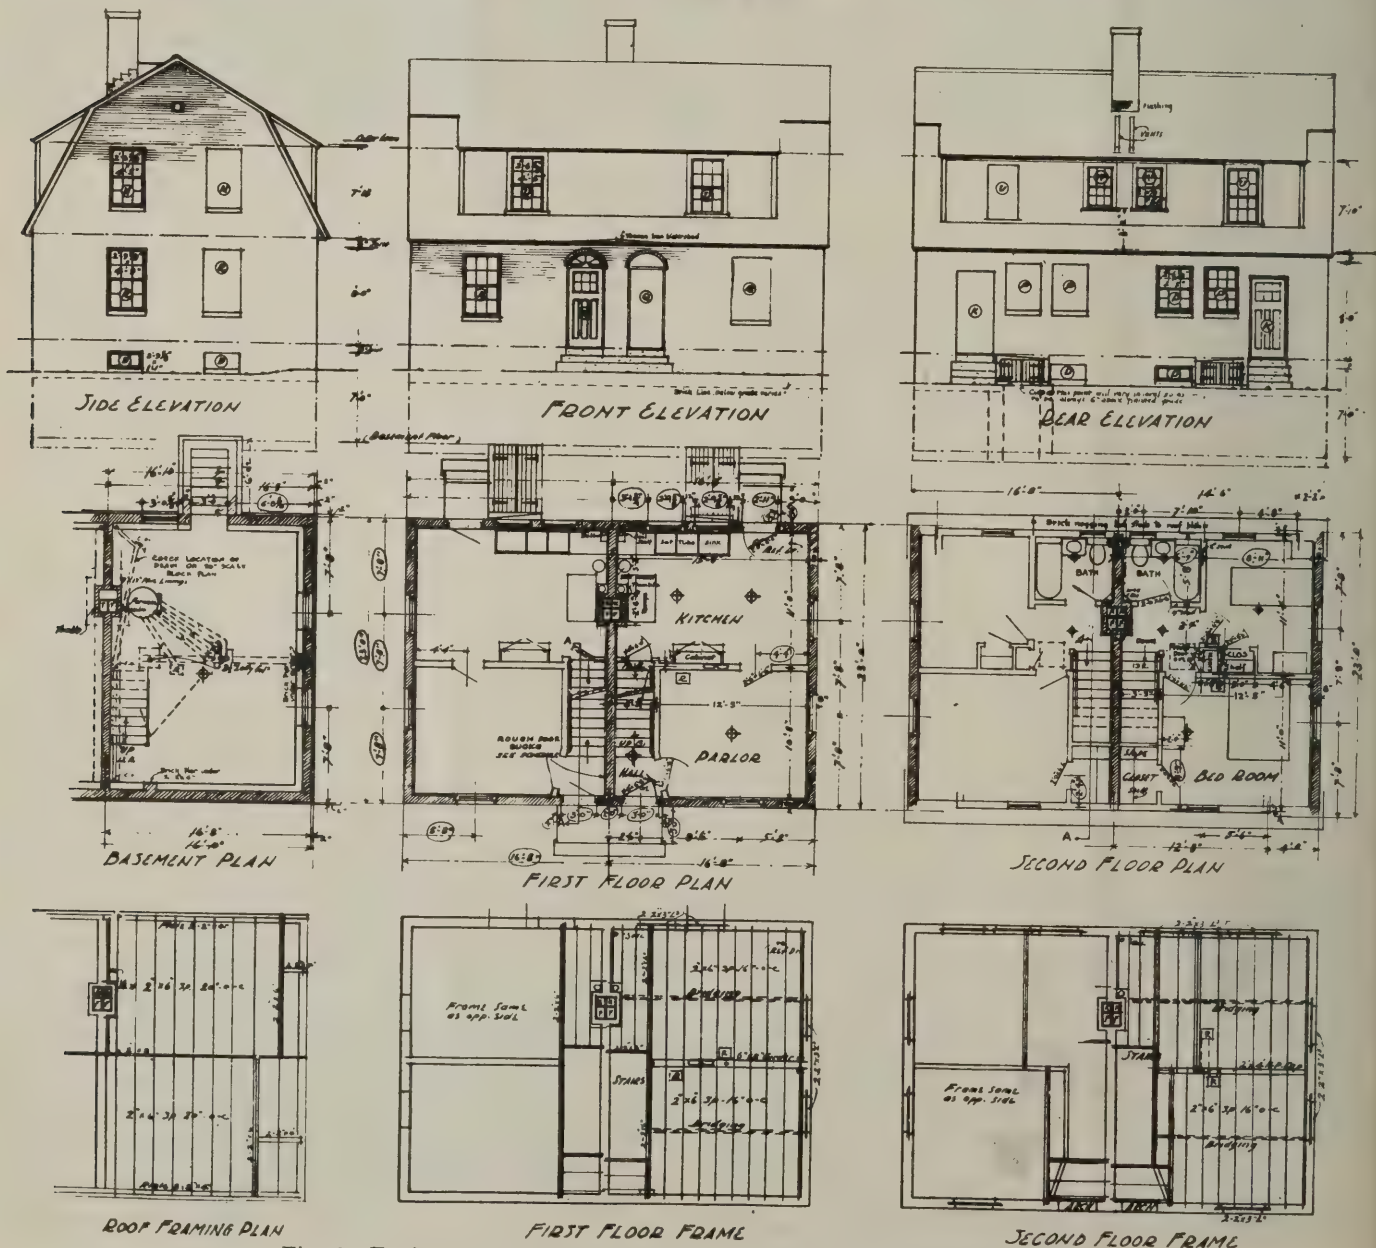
Typical plan and elevation of a four-room, semi-detached house
